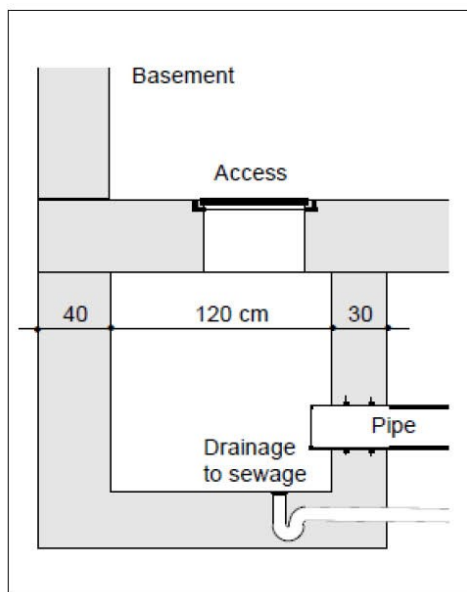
Detailed section of the watertight concrete duct of 30 cm wall thickness and the pipe seals (Hollmuller, 2002).
